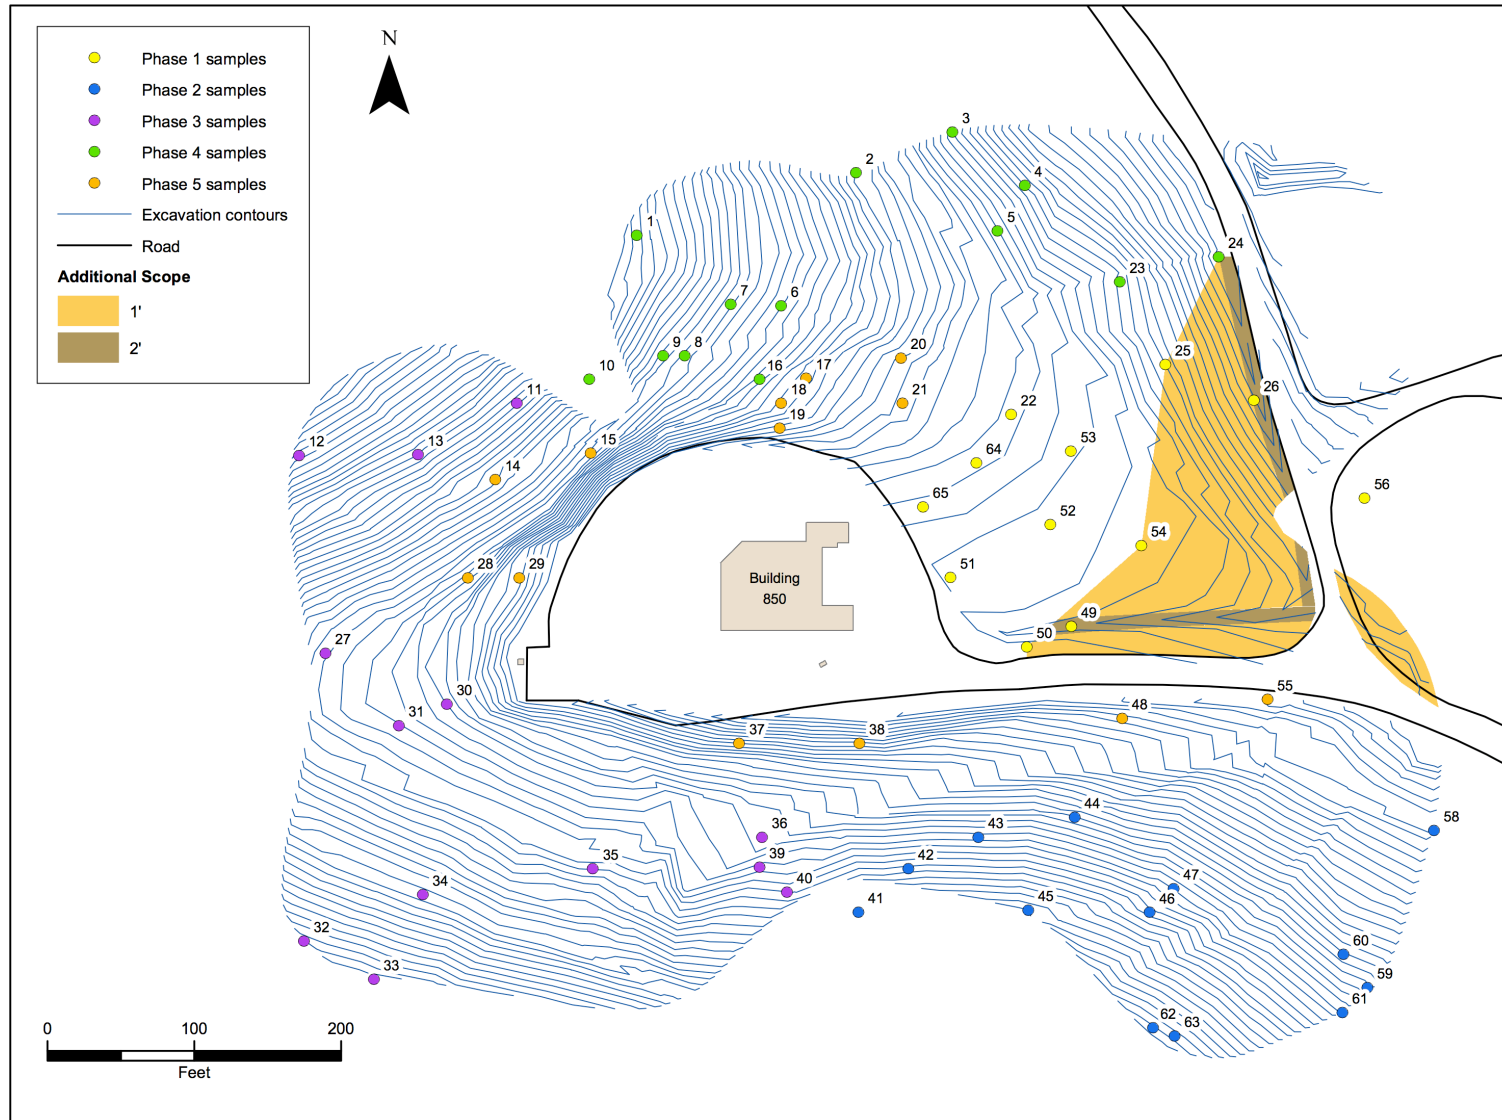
Building 850 Soil Excavation, Additional Scope - June 16, 2009
